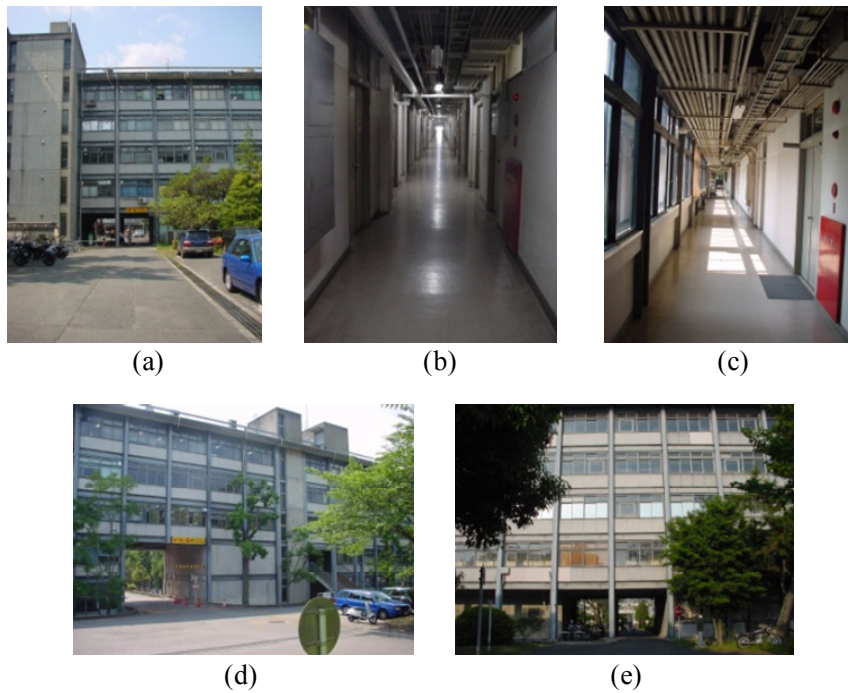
Photos: (a) South elevation; (b) South passage; (c) East passage; (d) East elevation; (e) West elevation
